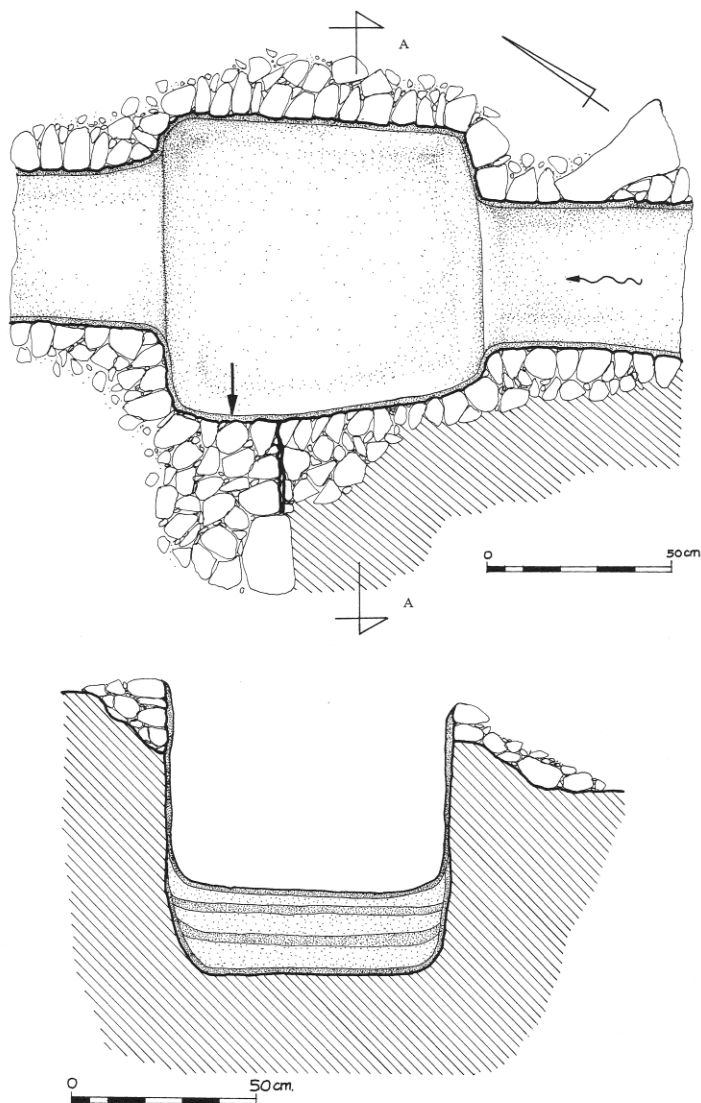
The Shechem–Samaria aqueduct, settling pool, plan and section (author).
